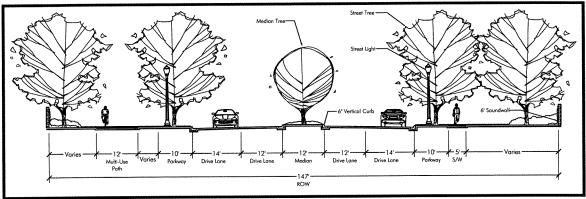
Arterial Road - Union Road South of Community Entries, Section L
